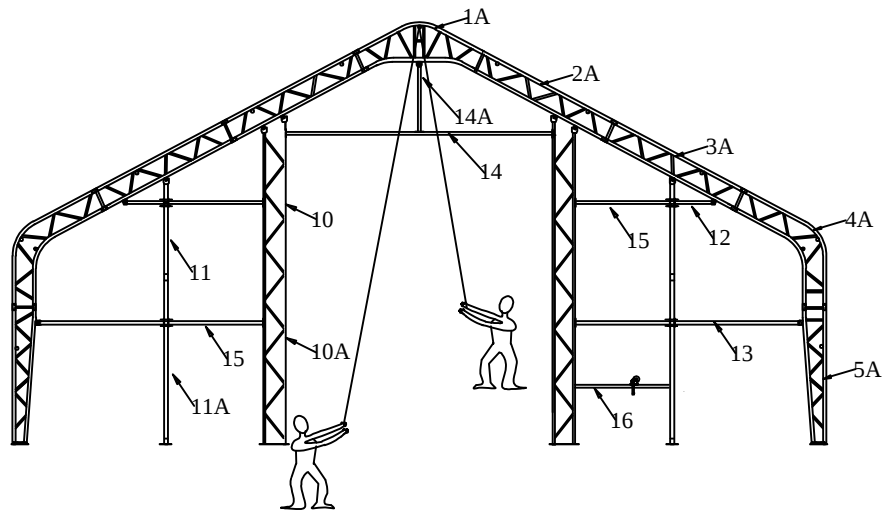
THE ROPE IS TO HOLD THE FRAME IN PLACE
